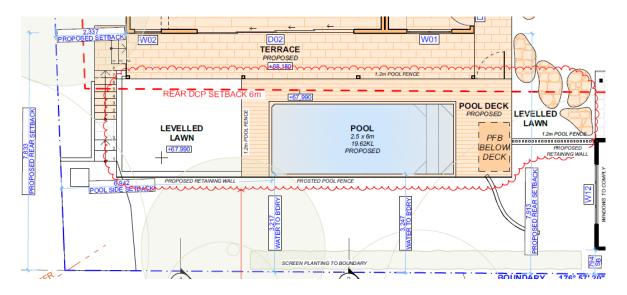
Extract from MOD Plans showing the proposed rear setbacks to the pool and decking
